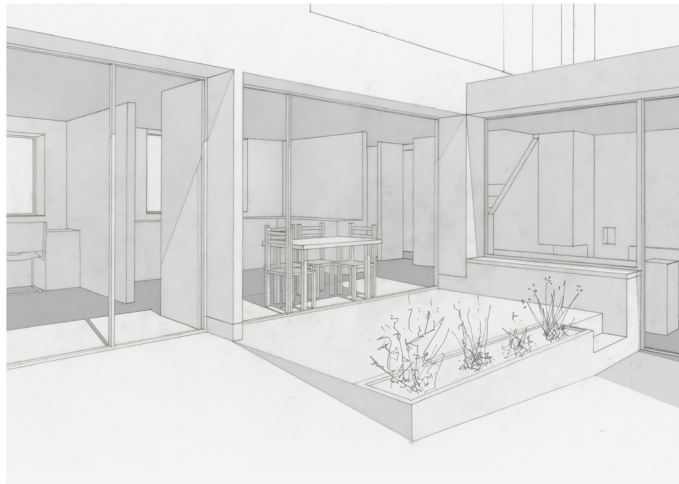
Perspective of inner private courtyard through to the office, kitchen and living room; Fig. 7.162 Perspective of living room
